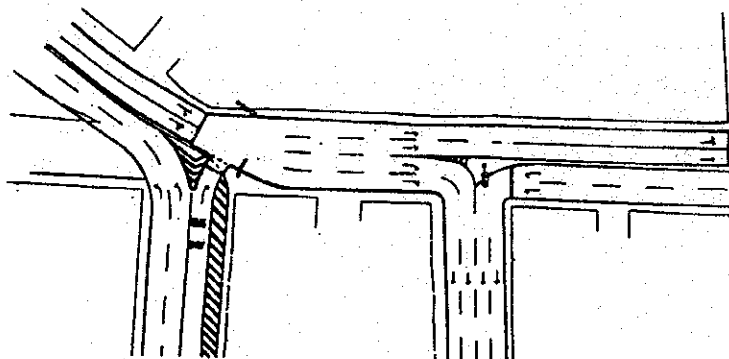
Concept of Improvement Plan on Jln. Gereja
